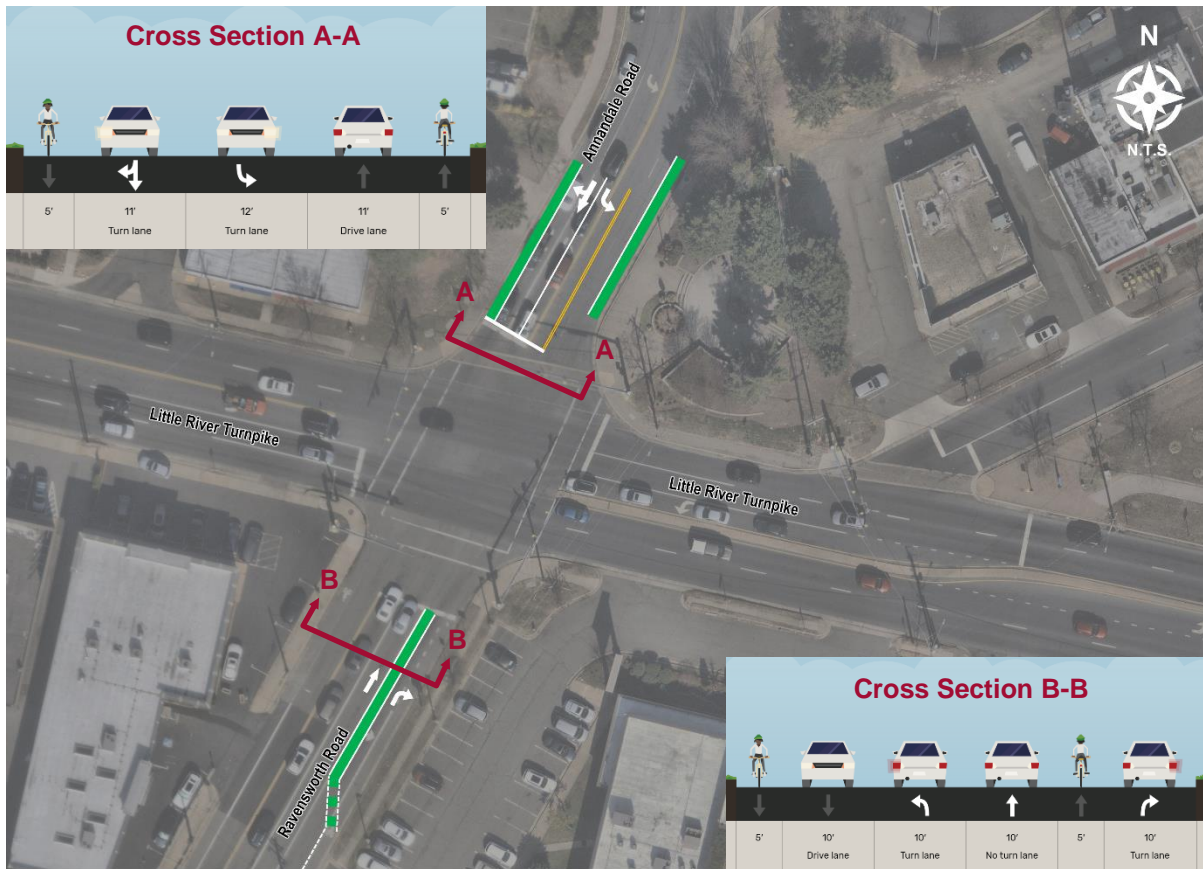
Intersection of Annandale Road and Little River Turnpike Build Conditions Cross Section and Plan View
